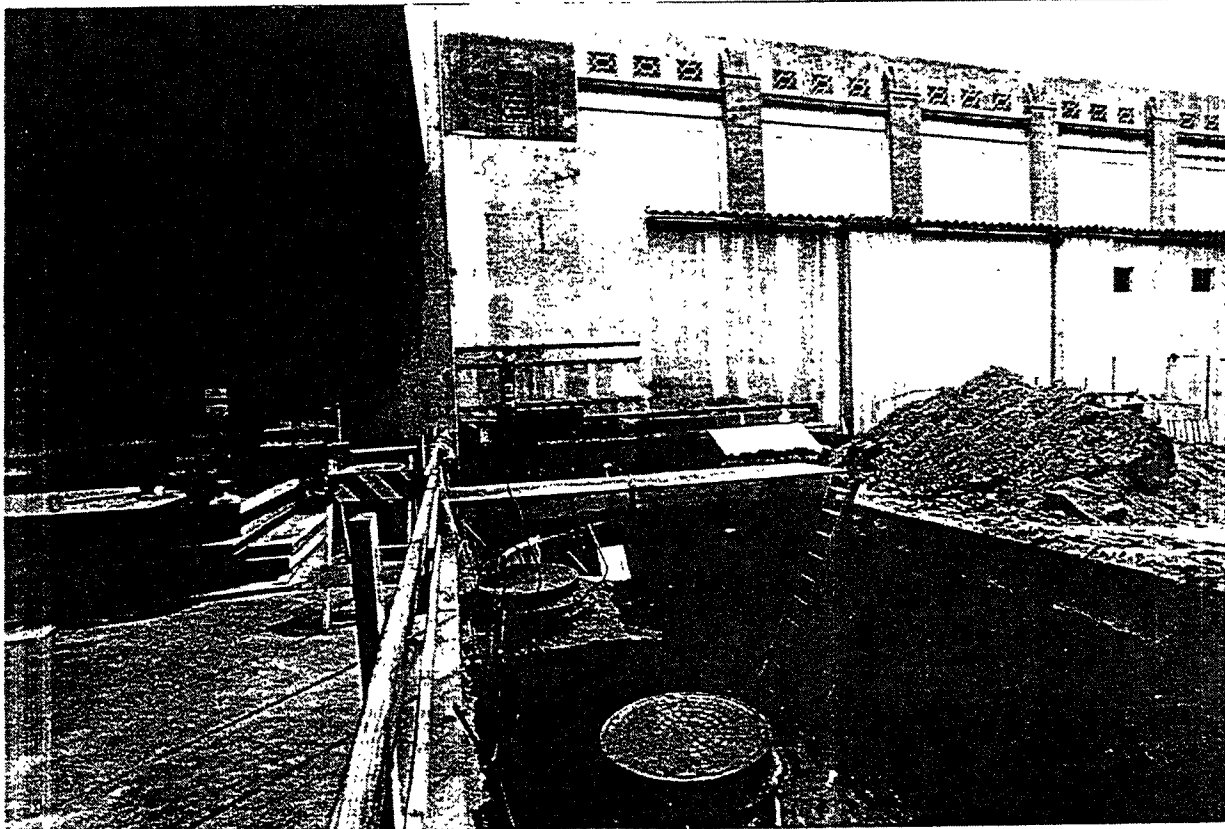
View of excavations for the west tunnel extension of the laboratory, looking eastwards at the west wall of the main building housing the lab. (Photo taken January 16, 1997.)
